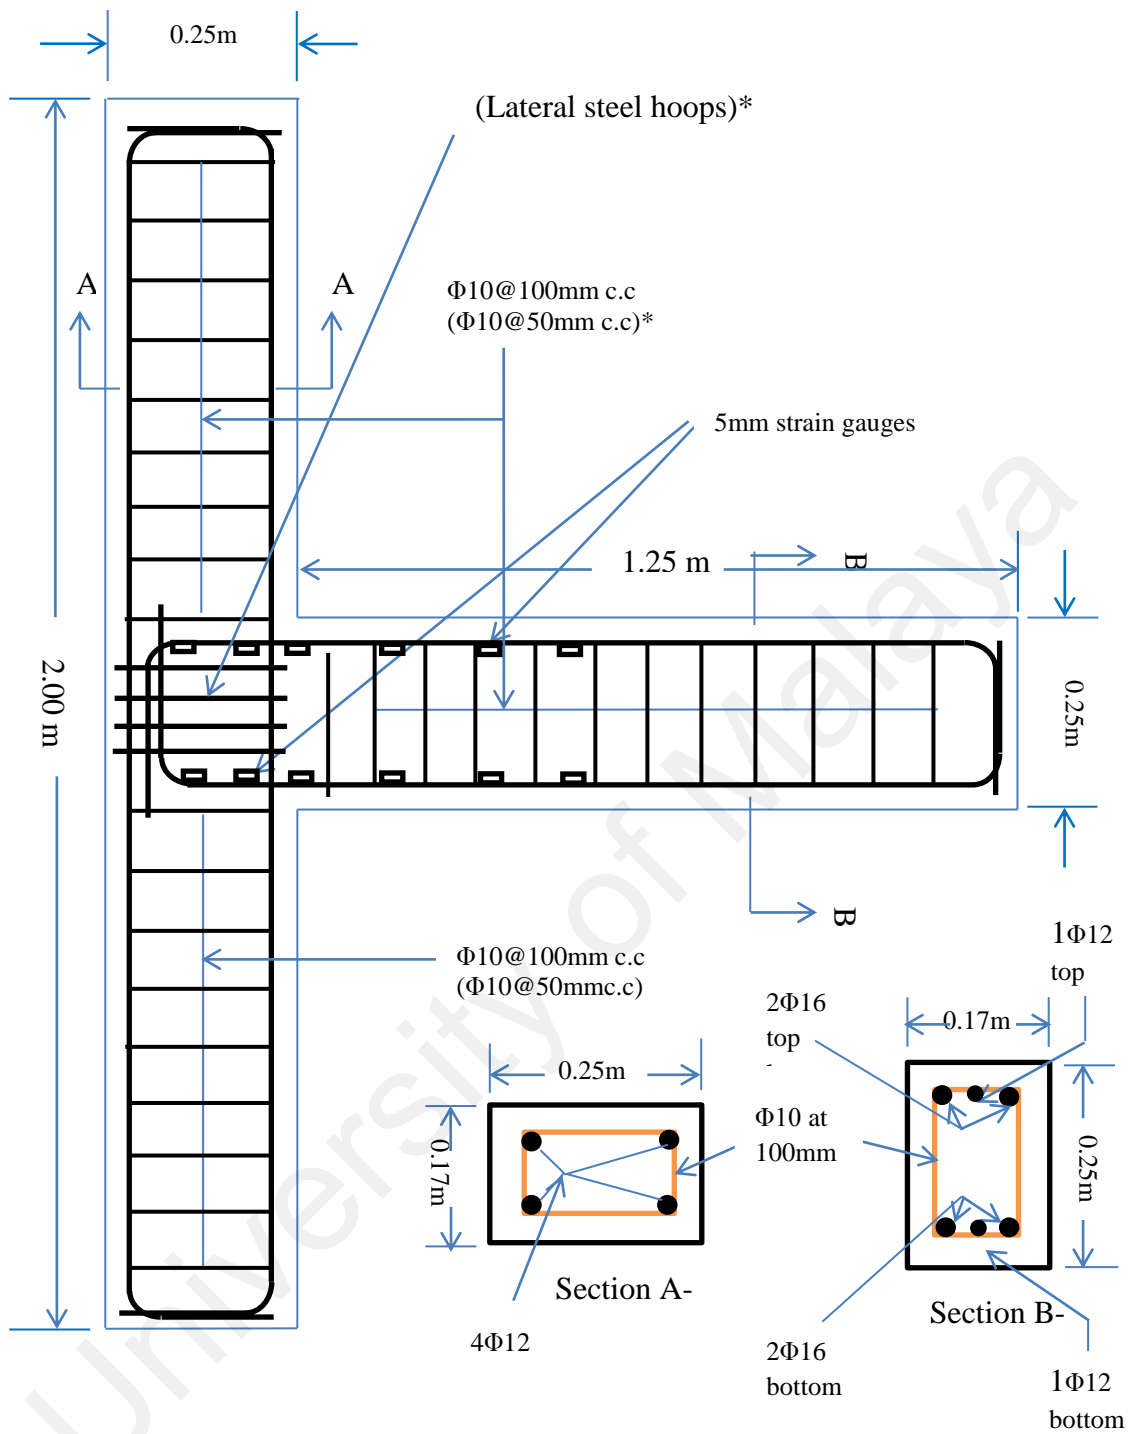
Beam-column specimen, reinforcing details and dimensions
